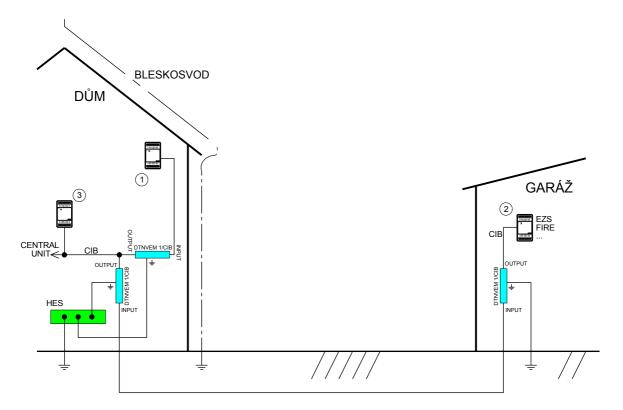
Typical wiring of DTNVEM 1/CIB protection
